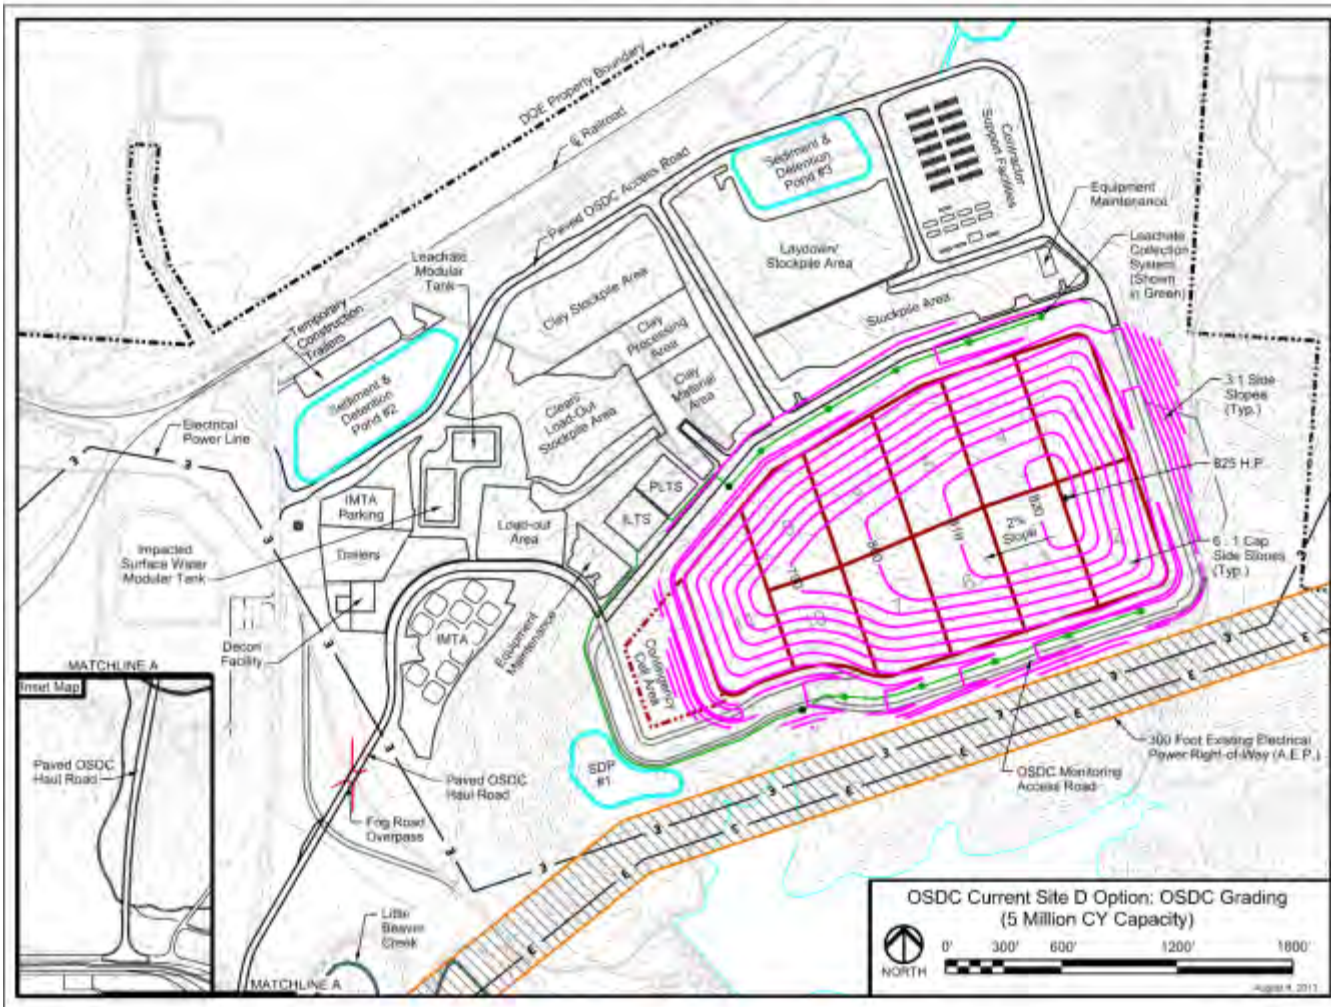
Landfill Plan View – Finished Grading Plan for Alternative 2
